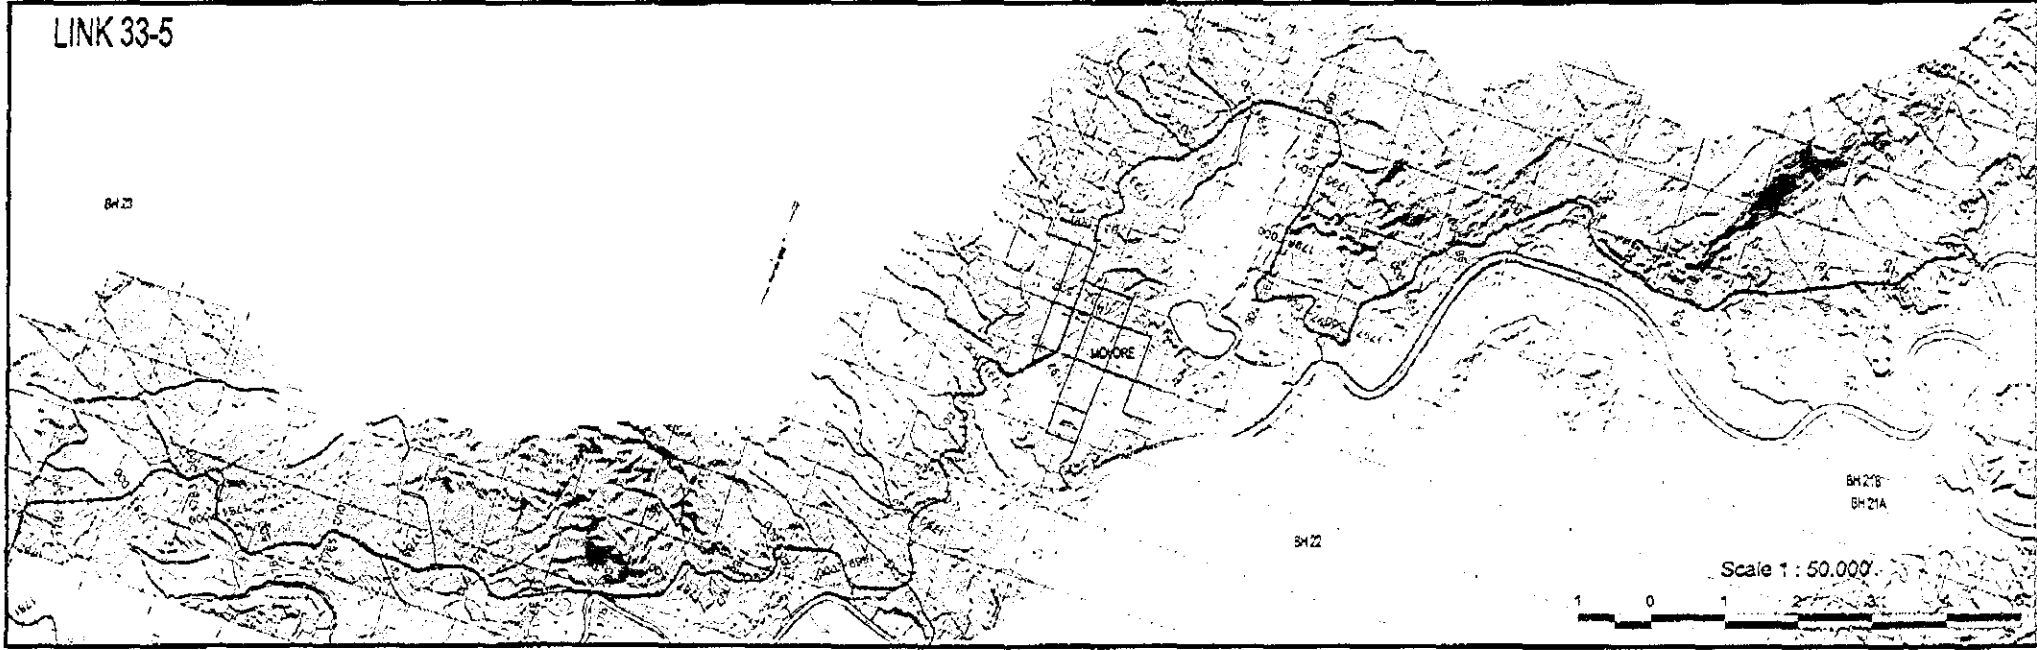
Road Alignment of Umpanga to Sandangpangan (7 of 11)
